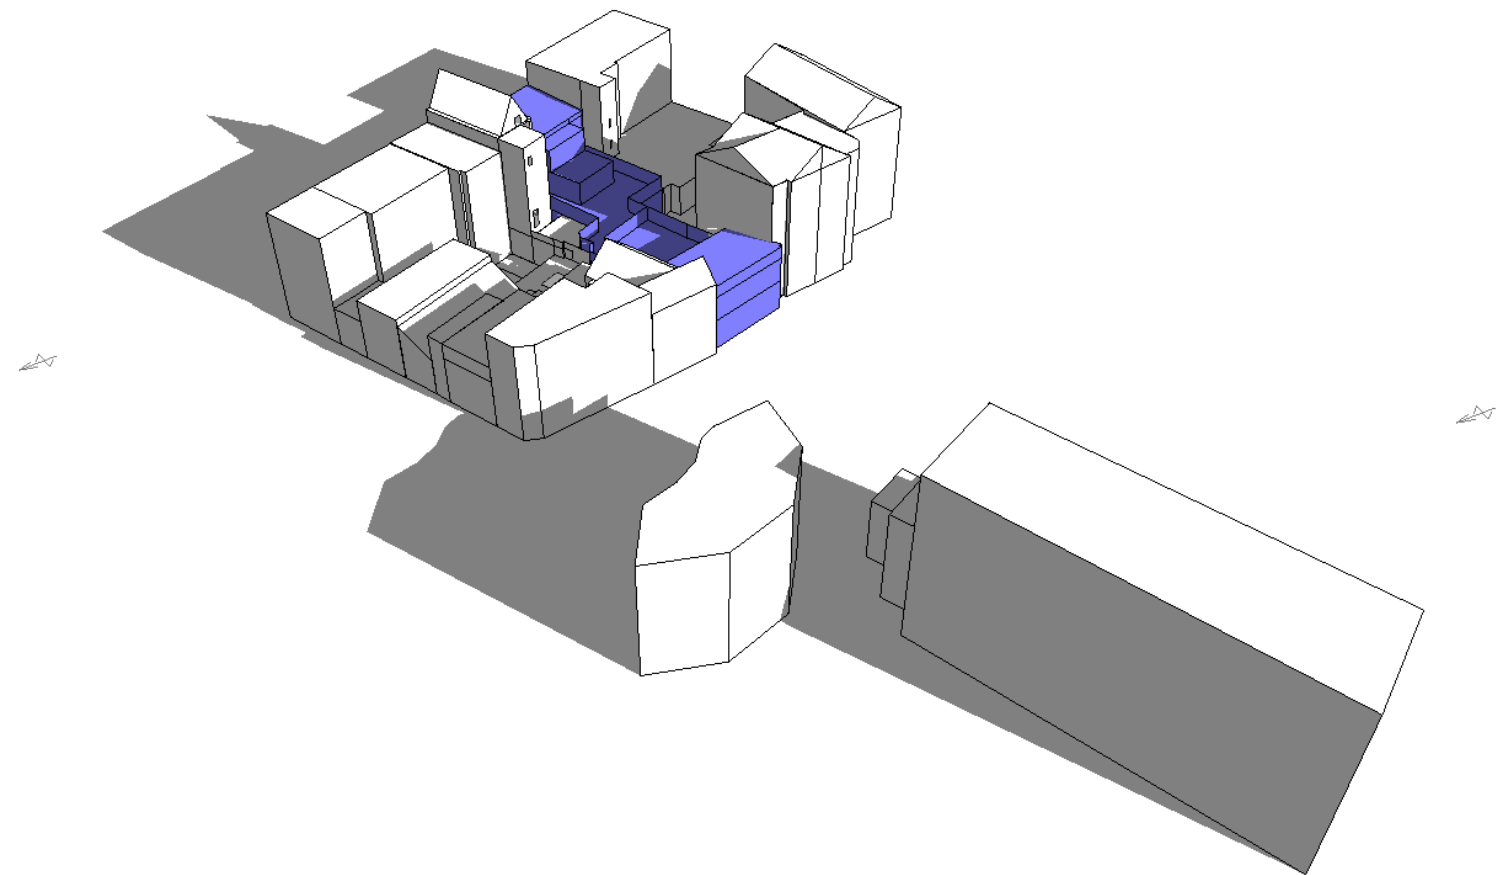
SHADOW – DEVELOPMENT “AS PROPOSED” – 21<sup>ST</sup> MARCH AT 3:30 PM – PLAN
